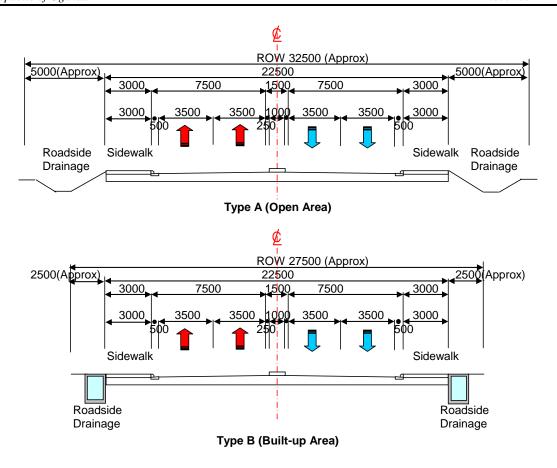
Proposed Typical Section of Mukwano Road
